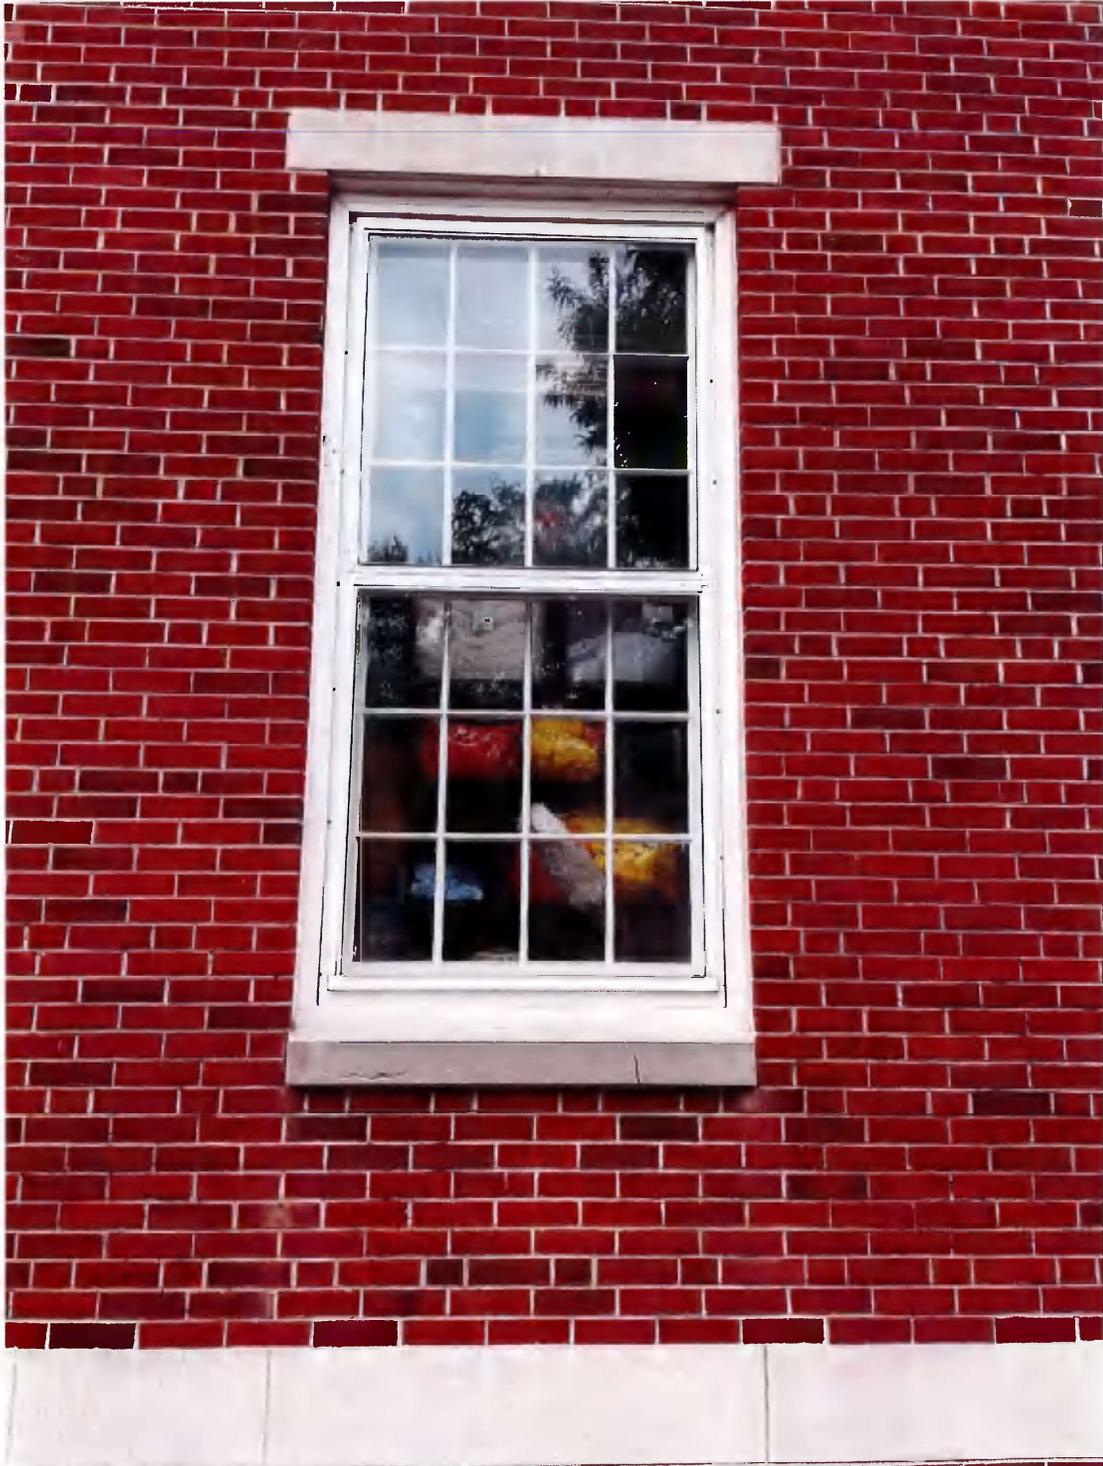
Sikh Worship Center, side (south) elevation, window 12 exterior, June 23, 2025.
